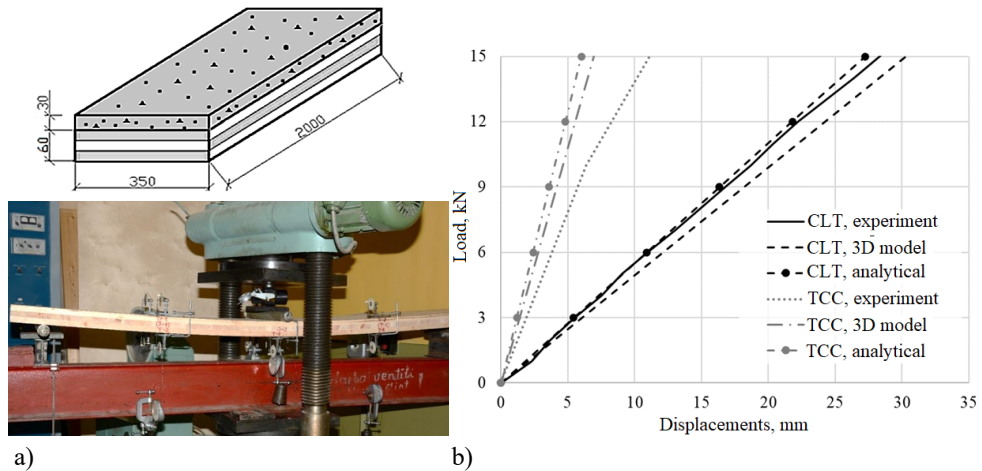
a) Overall dimensions of TCC and placement of CLT in loading equipment;
